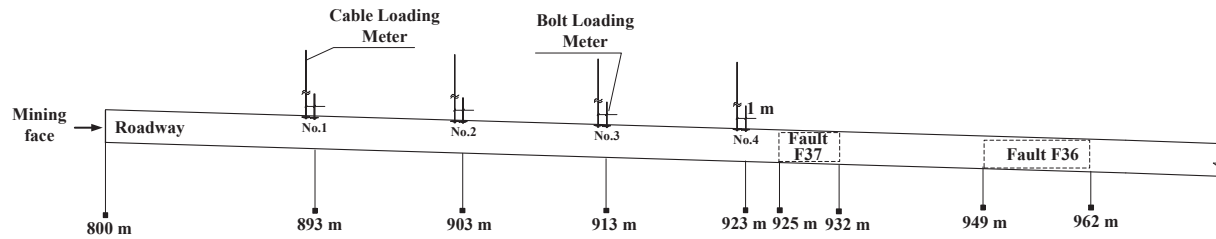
Arrangement of filed observation stations in the haulage roadway in mining panel #14-103.
